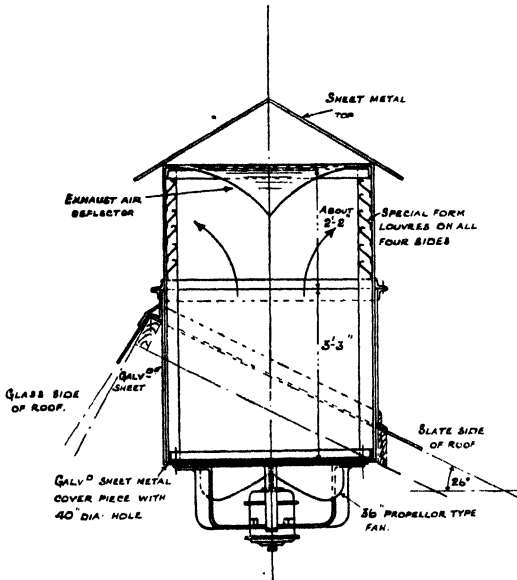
EXHAUSTING FAN AND OUTLET FOR NORTH-LIGHT TYPE ROOF
